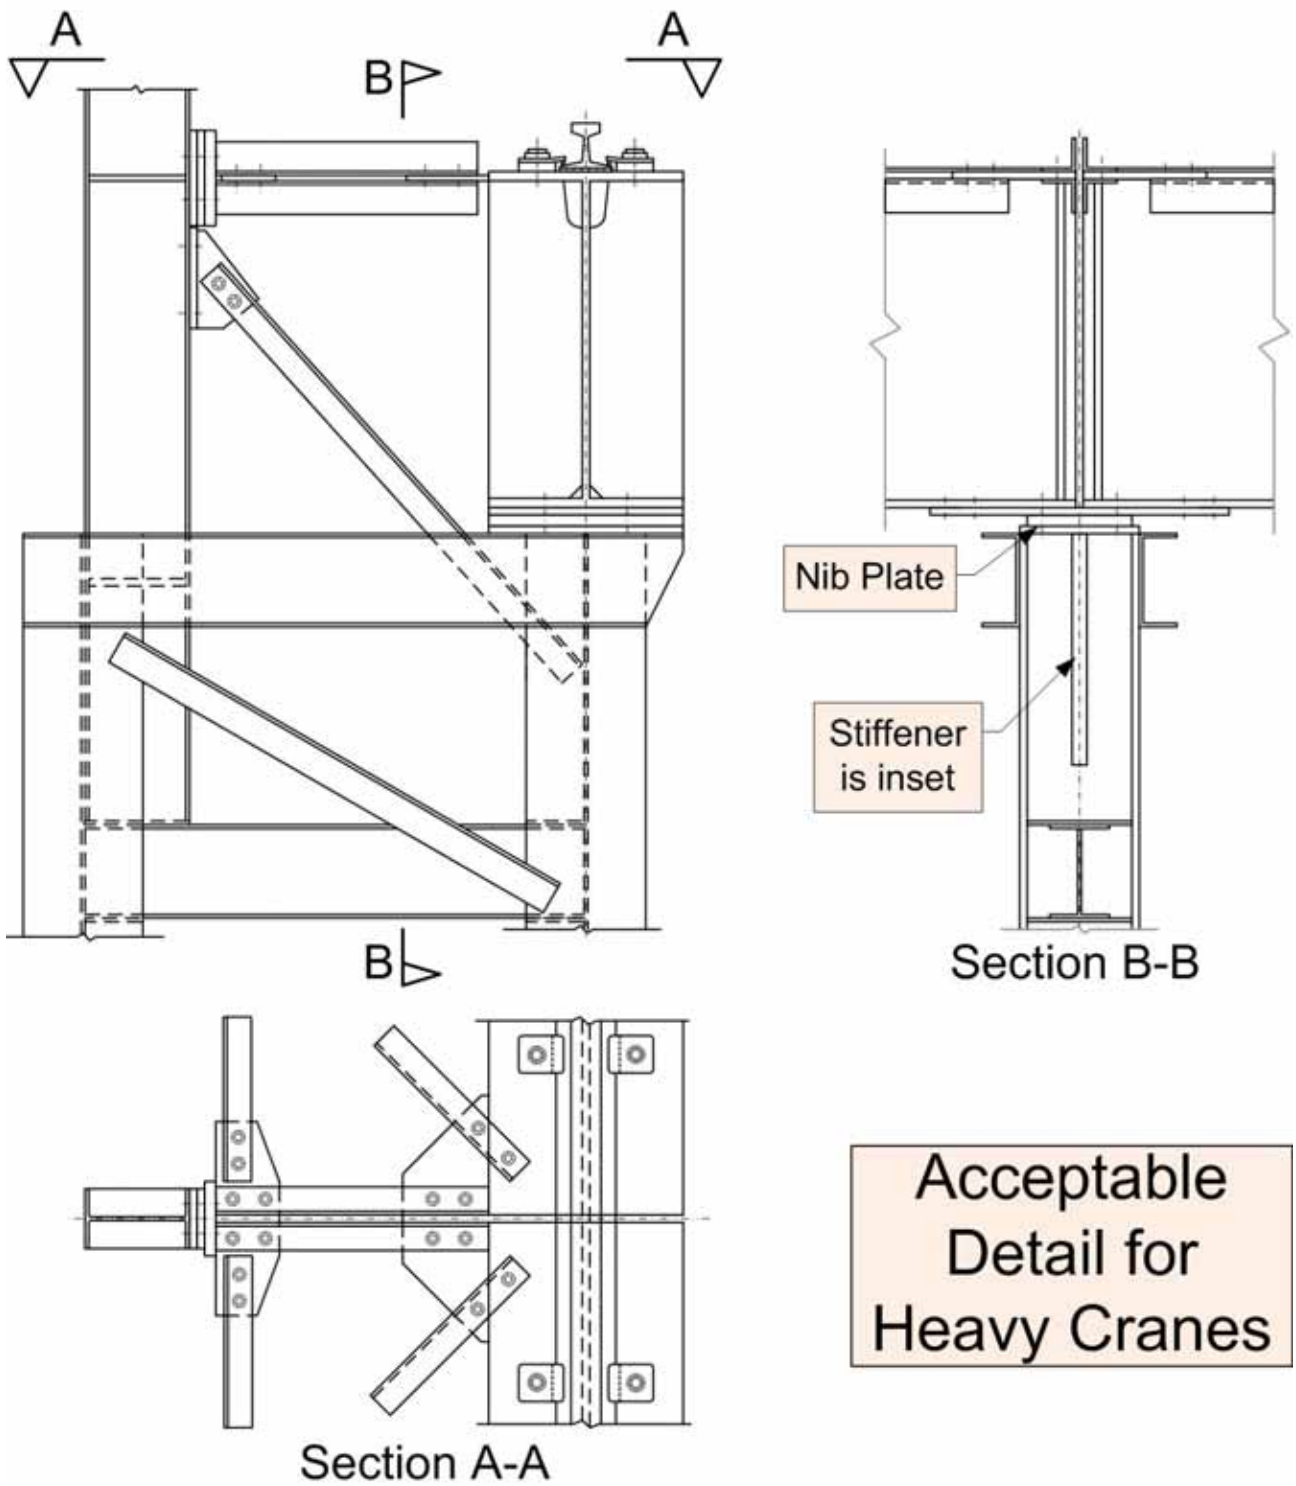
Tieback connection using a surge girder. Acceptable detail, but not recommended.
